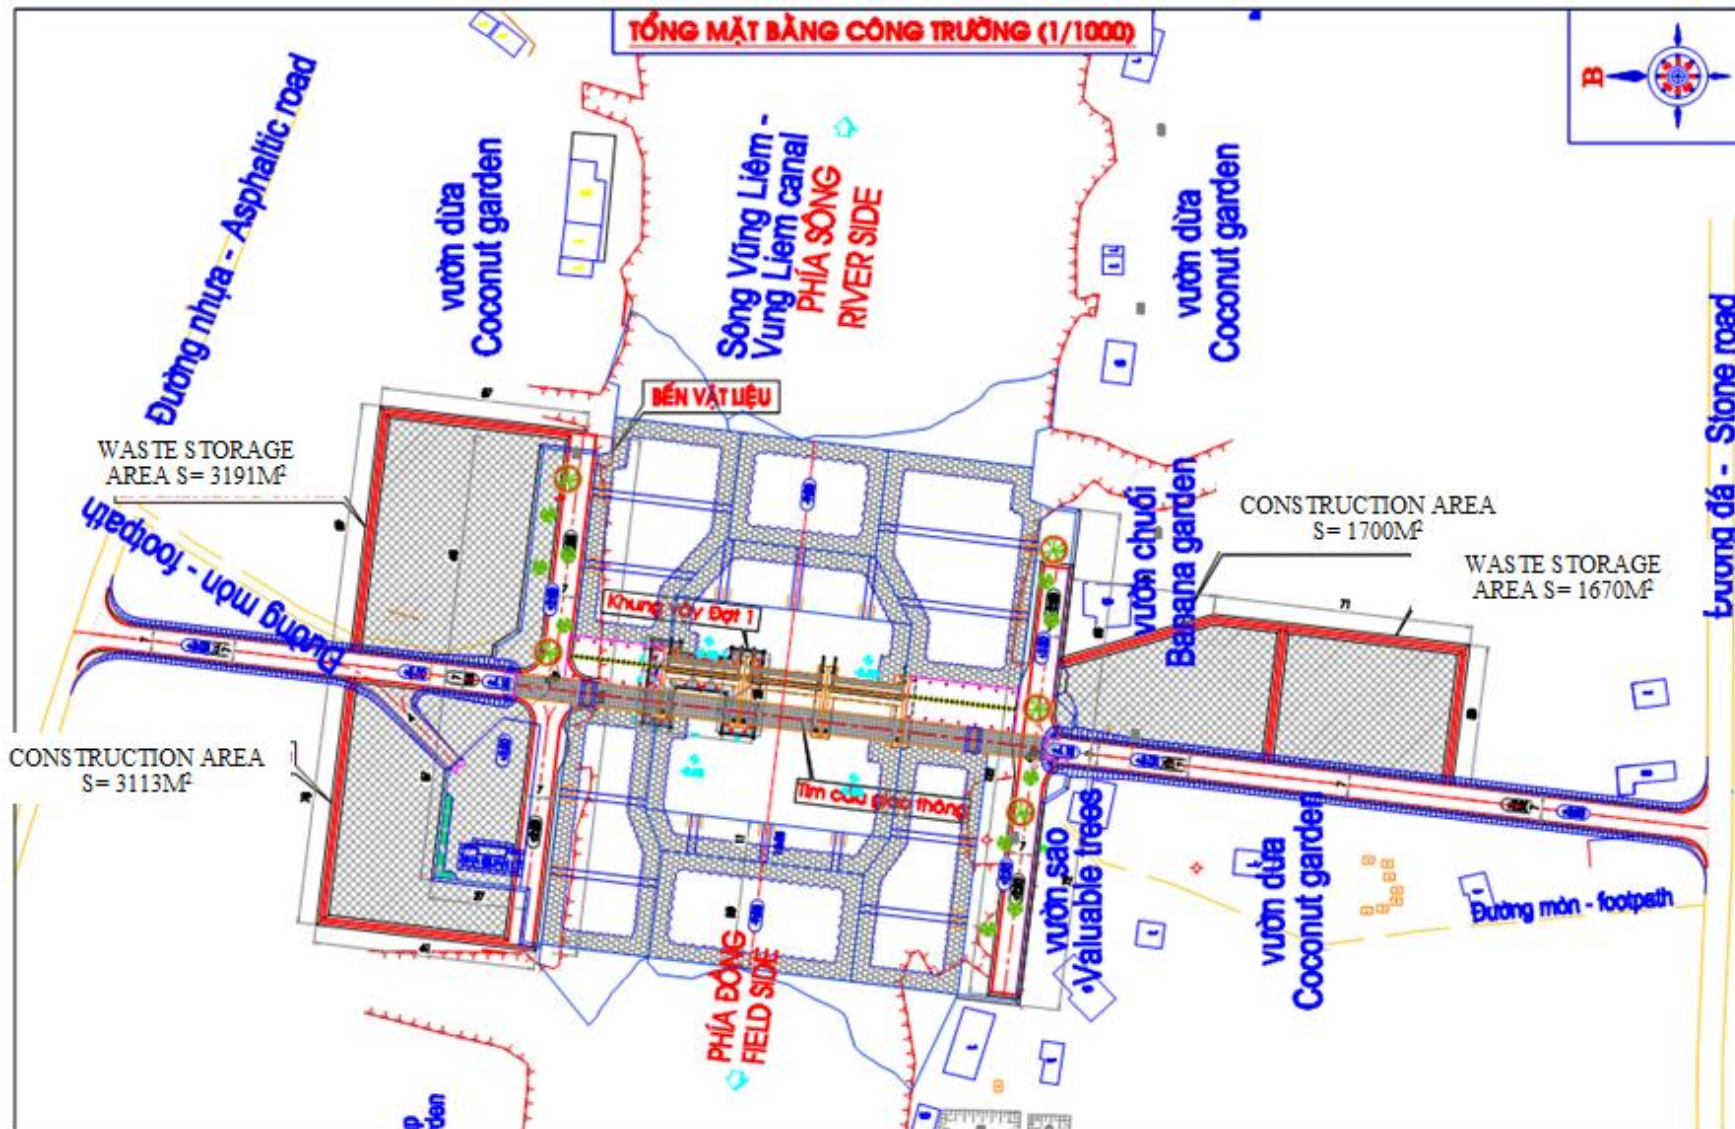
Locations for waste soil storage and disposal during construction of Vung Liem sluice gate
